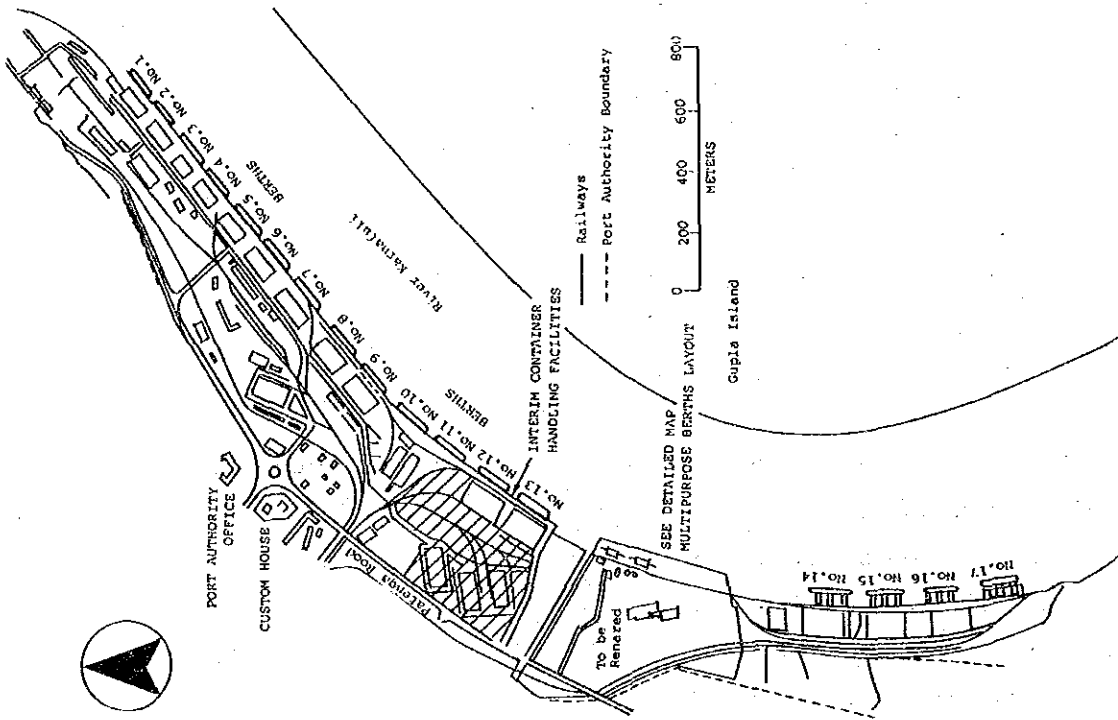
(a) Existing Facilities of Chittagong Port Fig. 5.2.1-(b) Facility Layout of Multi-purpose Terminal
